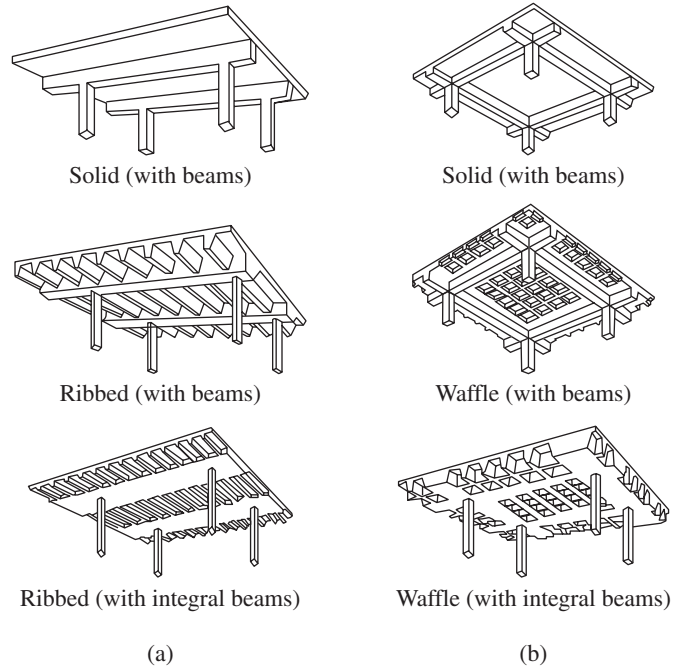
Types of slab designs (a) One-way slabs (b) Two-way slabs
